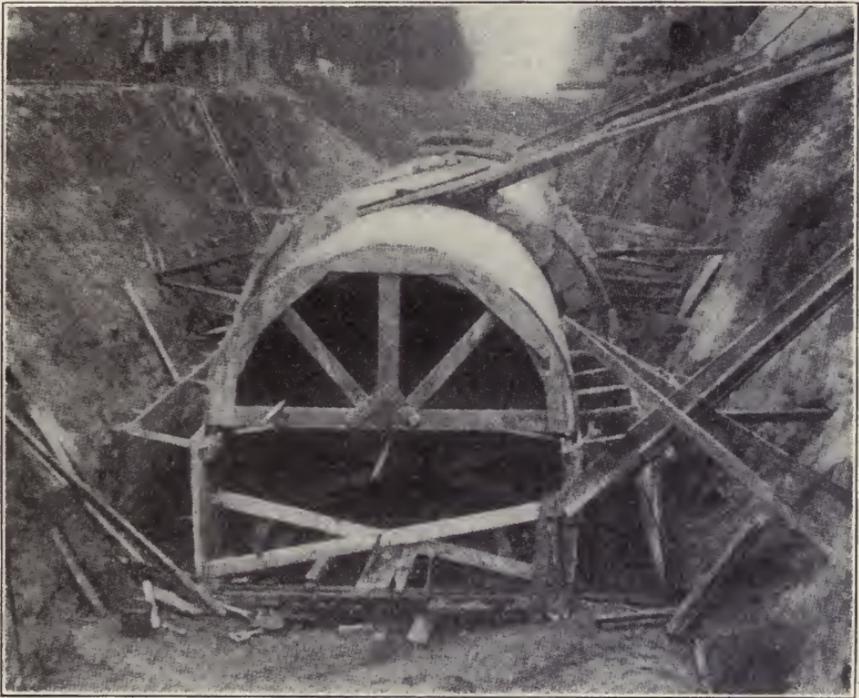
Construction of Dry-Run Concrete Sewer, Waterloo; Iowa.
